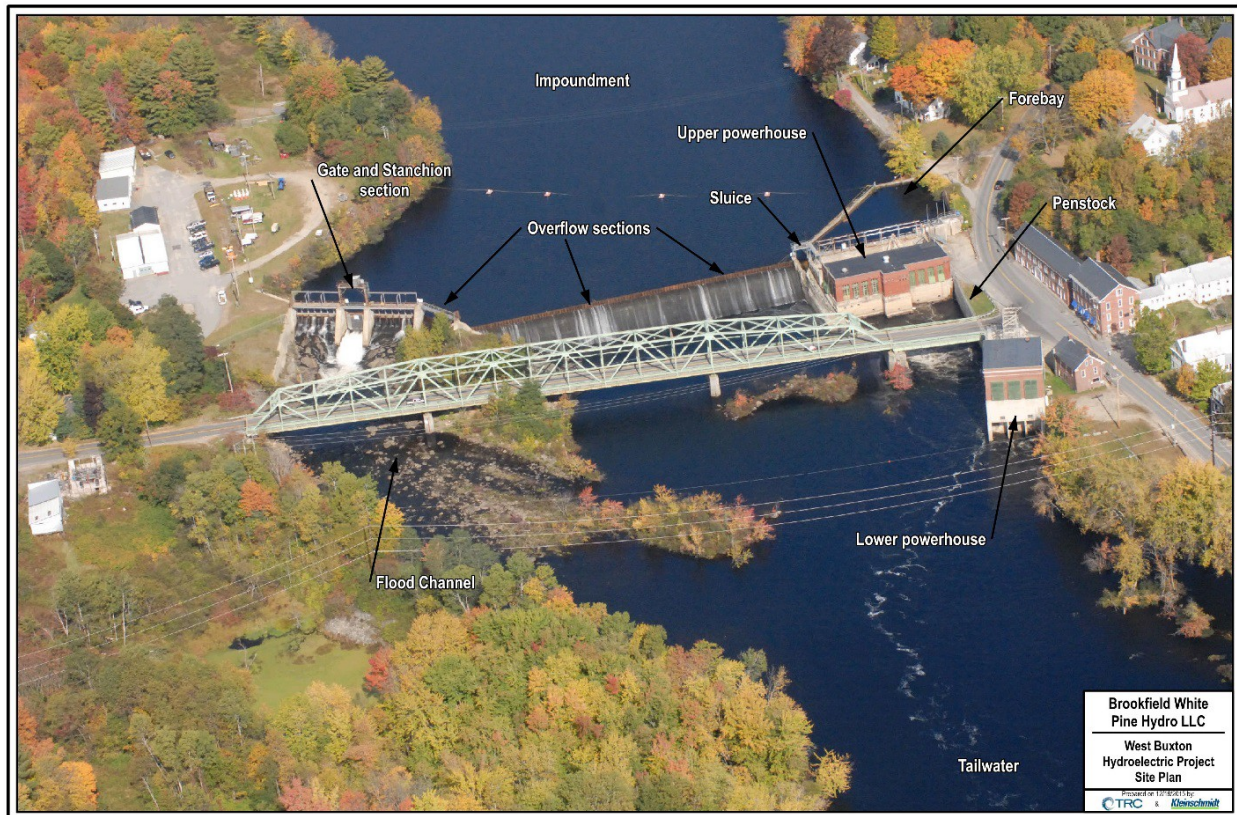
West Buxton Project site plan (Source: White Pine Hydro, 2015; as modified by staff).
